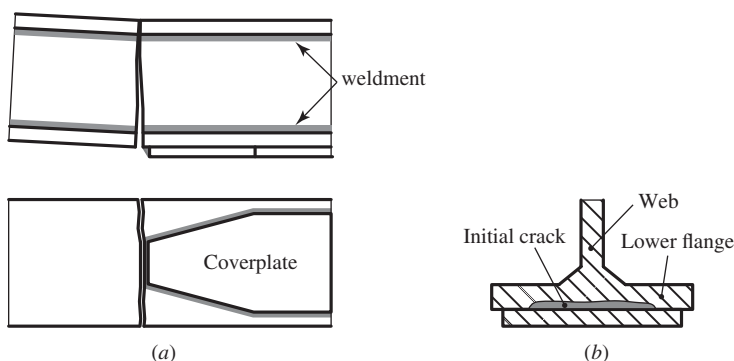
(a) Location of the fracture. (b) Location of the initial crack.
